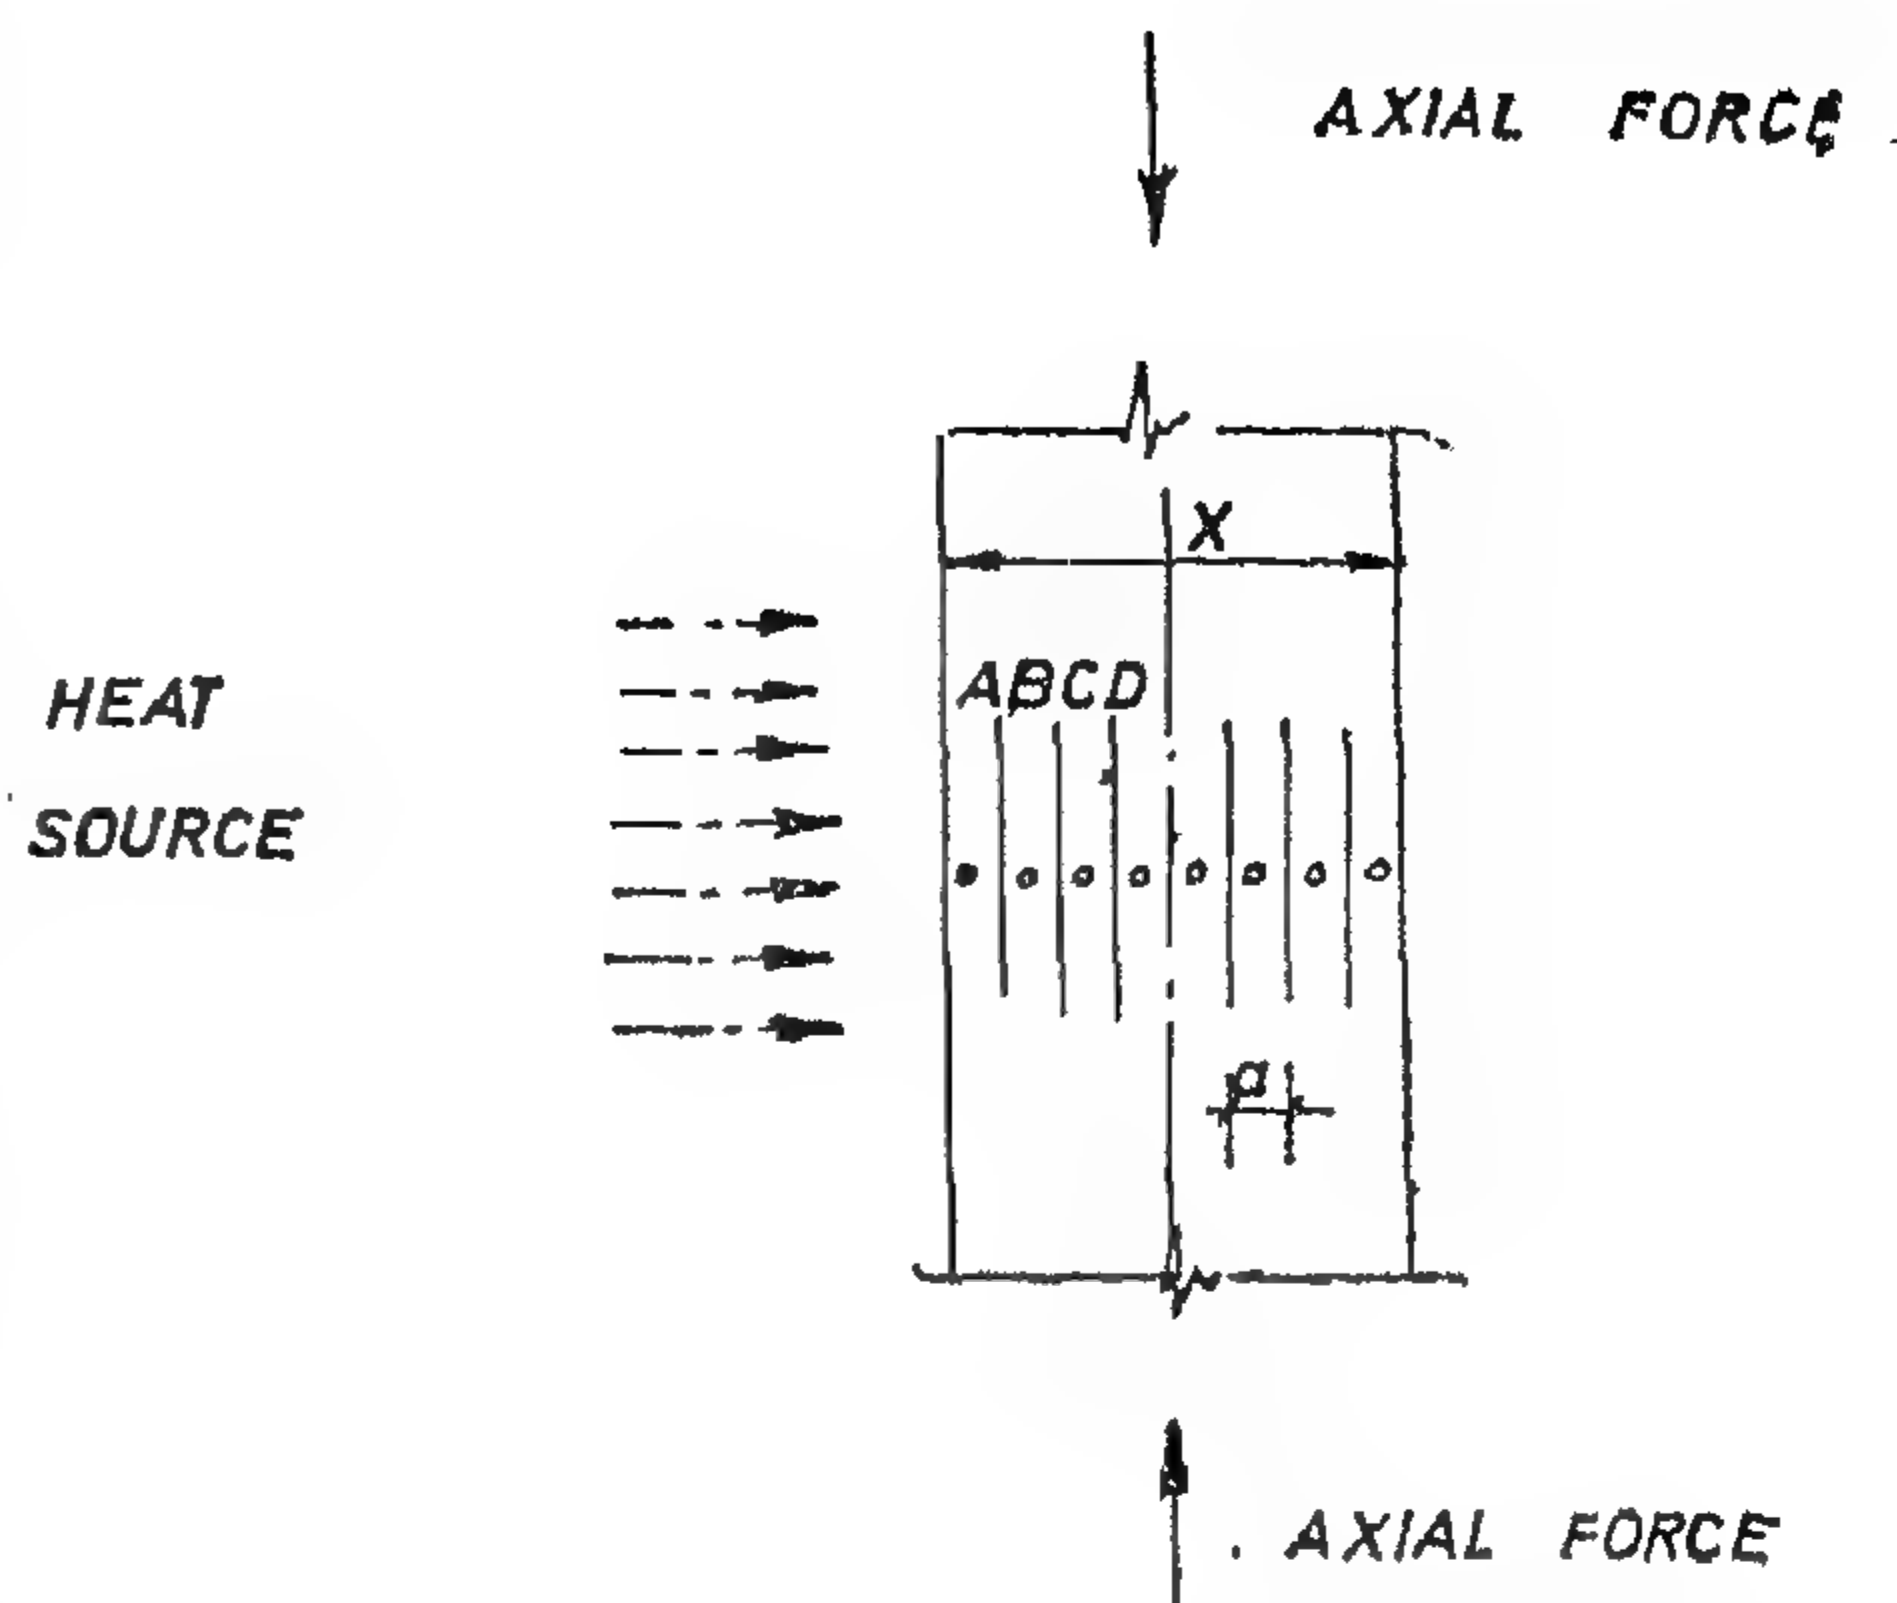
Schematic arrangement of dividing vessel concrete wall
